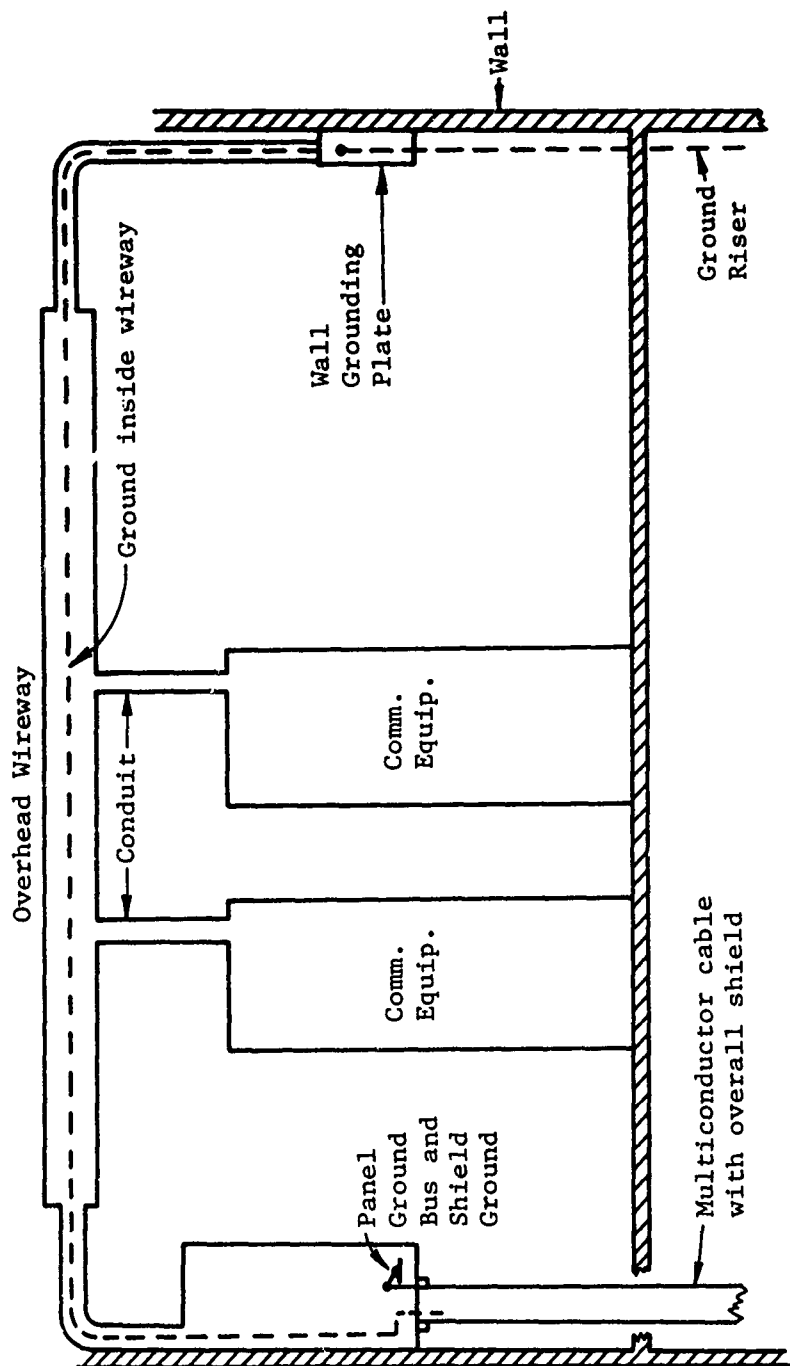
Grounding of equipment racks (grounding arrangement as is).
